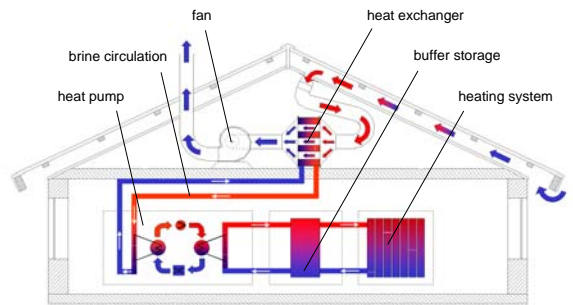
Scheme design for accumulated heat utilization under metal with a heating pump.
